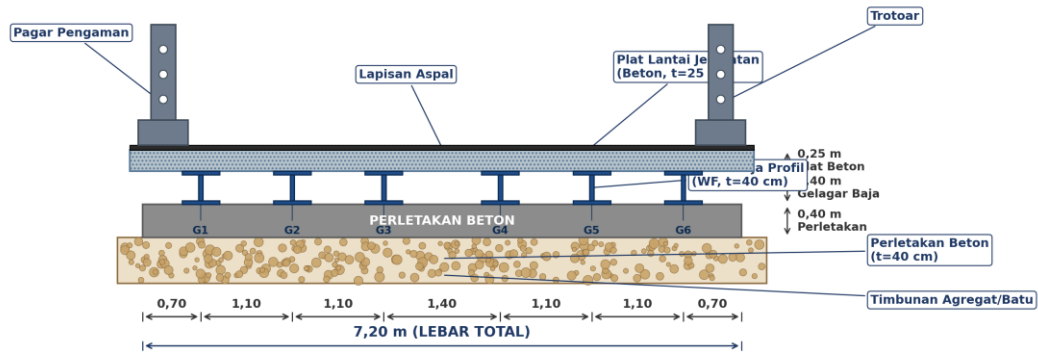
Cross-section of Brai 2 Bridge: 6.00 m carriageway, 7.20 m total width, and six WF steel girders. Source: Author analysis and technical drawing, 2026.
